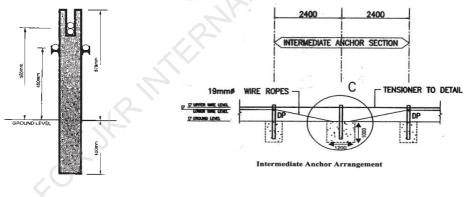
Typical Standard Drawing for Wire Rope Safety Barrier
